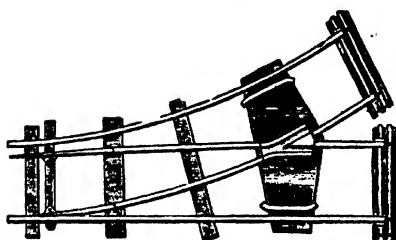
Light Steel Railway (Right-hand Points or Crossing).
